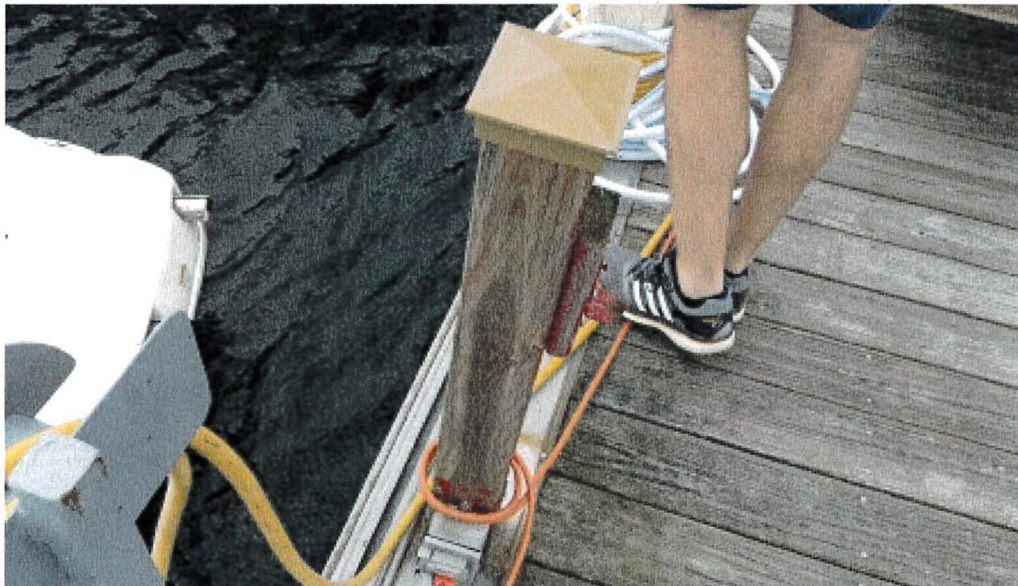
West Main – Dock F. Pile 14. Steel Wire instead of Pile Guide. Welded Capping U Section and Bearing Pad Failed
